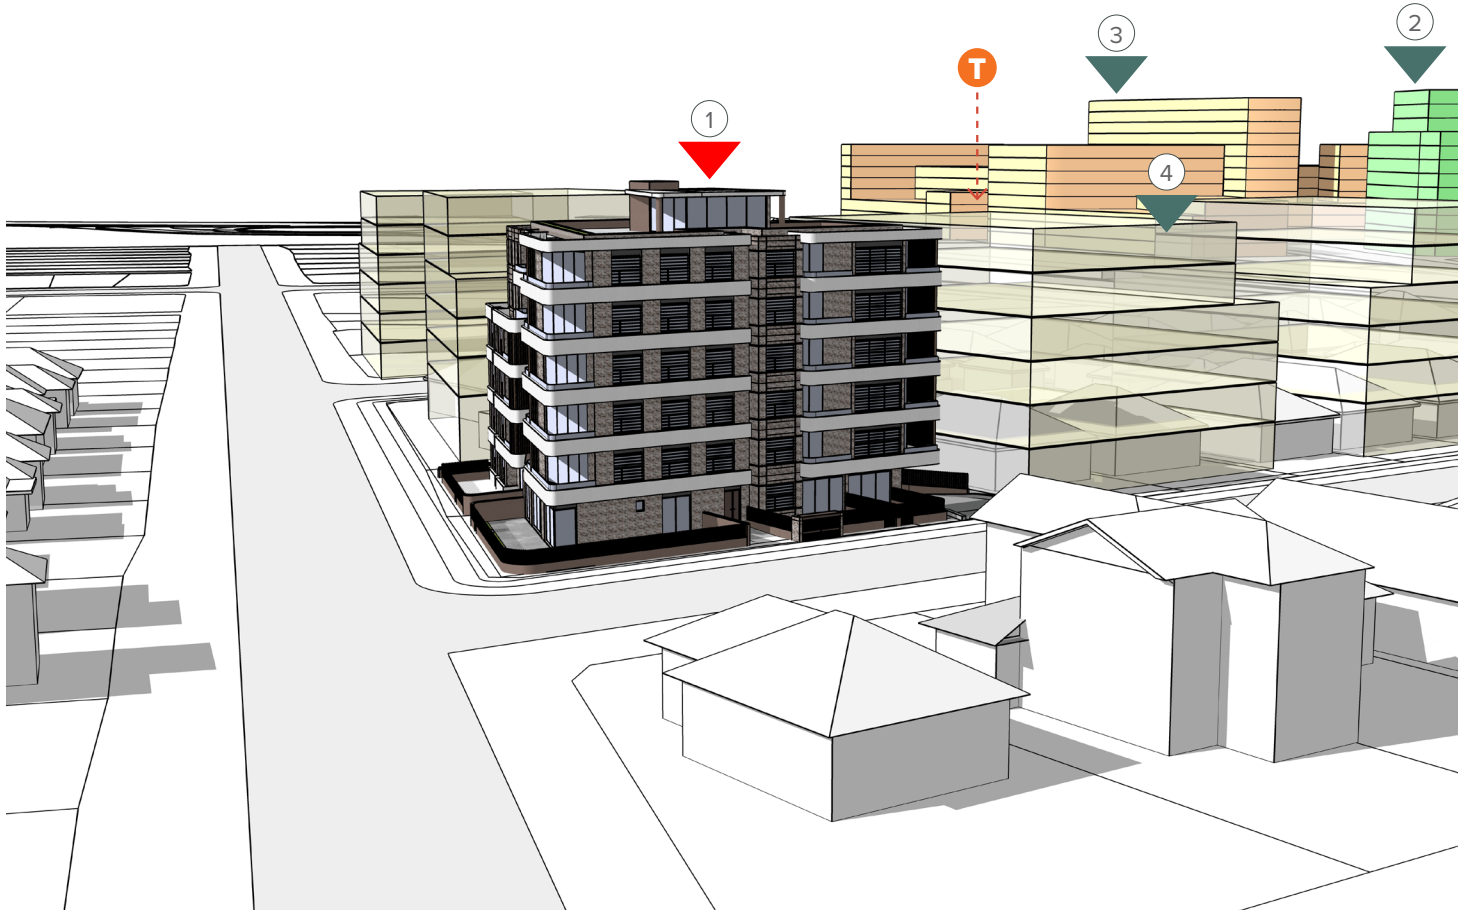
Proposed Future Massing Looking East, 15 - 17 Lupin Avenue (inc. Villawood Town Centre)
